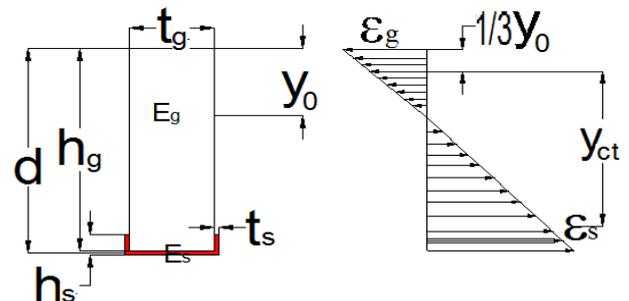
Cross-Section for Cracked Reinforced Glass Beam
